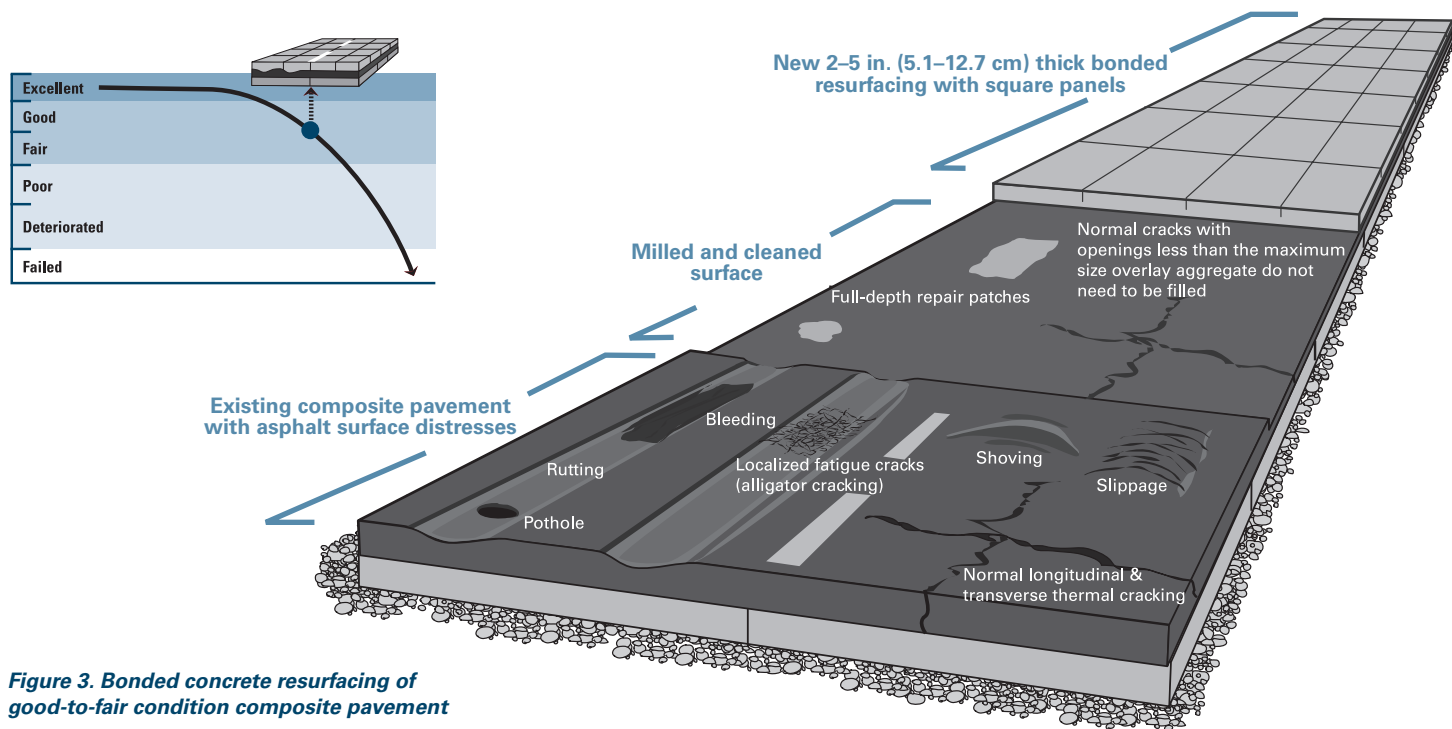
Bonded concrete resurfacing of good-to-fair condition composite pavement
